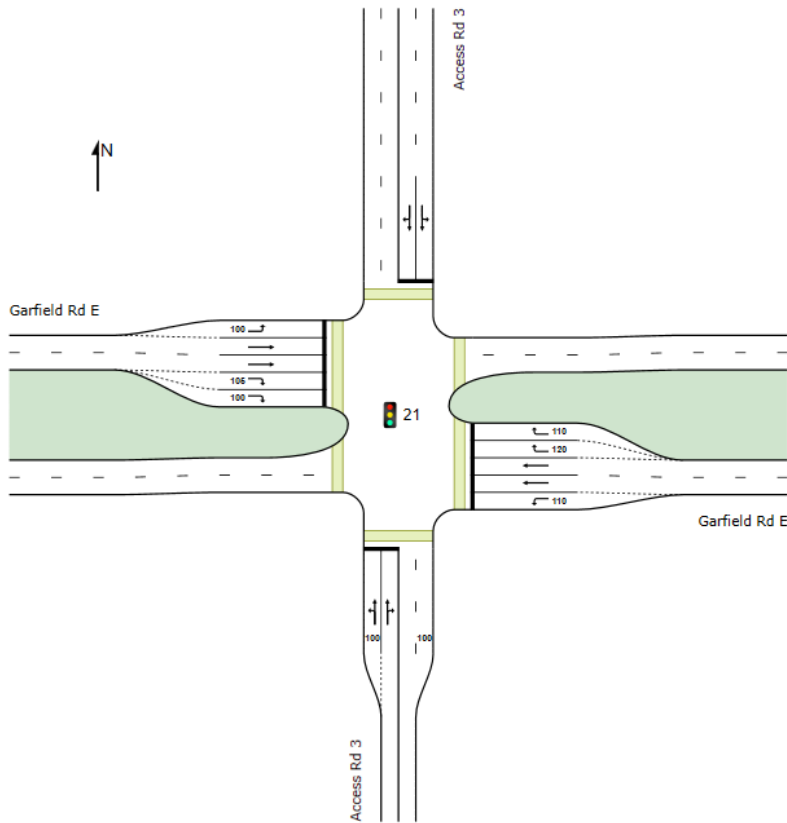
Garfield Road East – Access Road 3 (Intersection 21)
